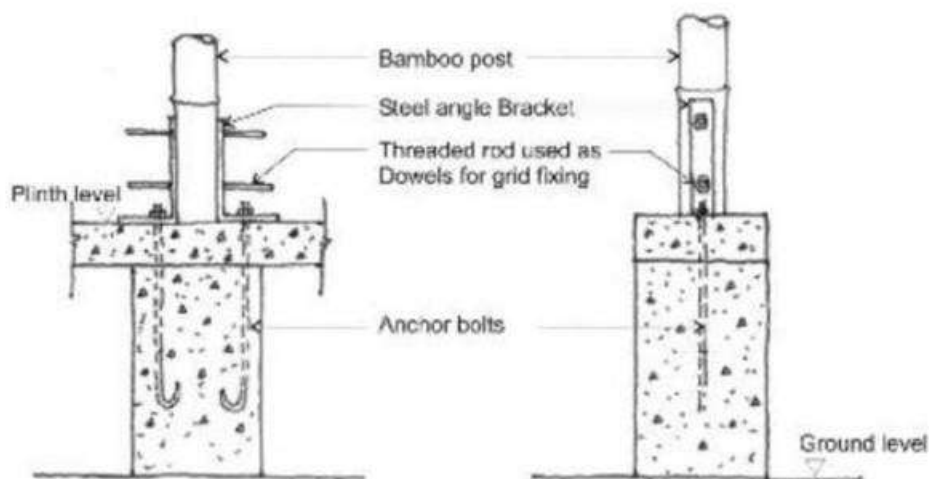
58 Fixing detail of bamboo to plinth using bolted connection.
